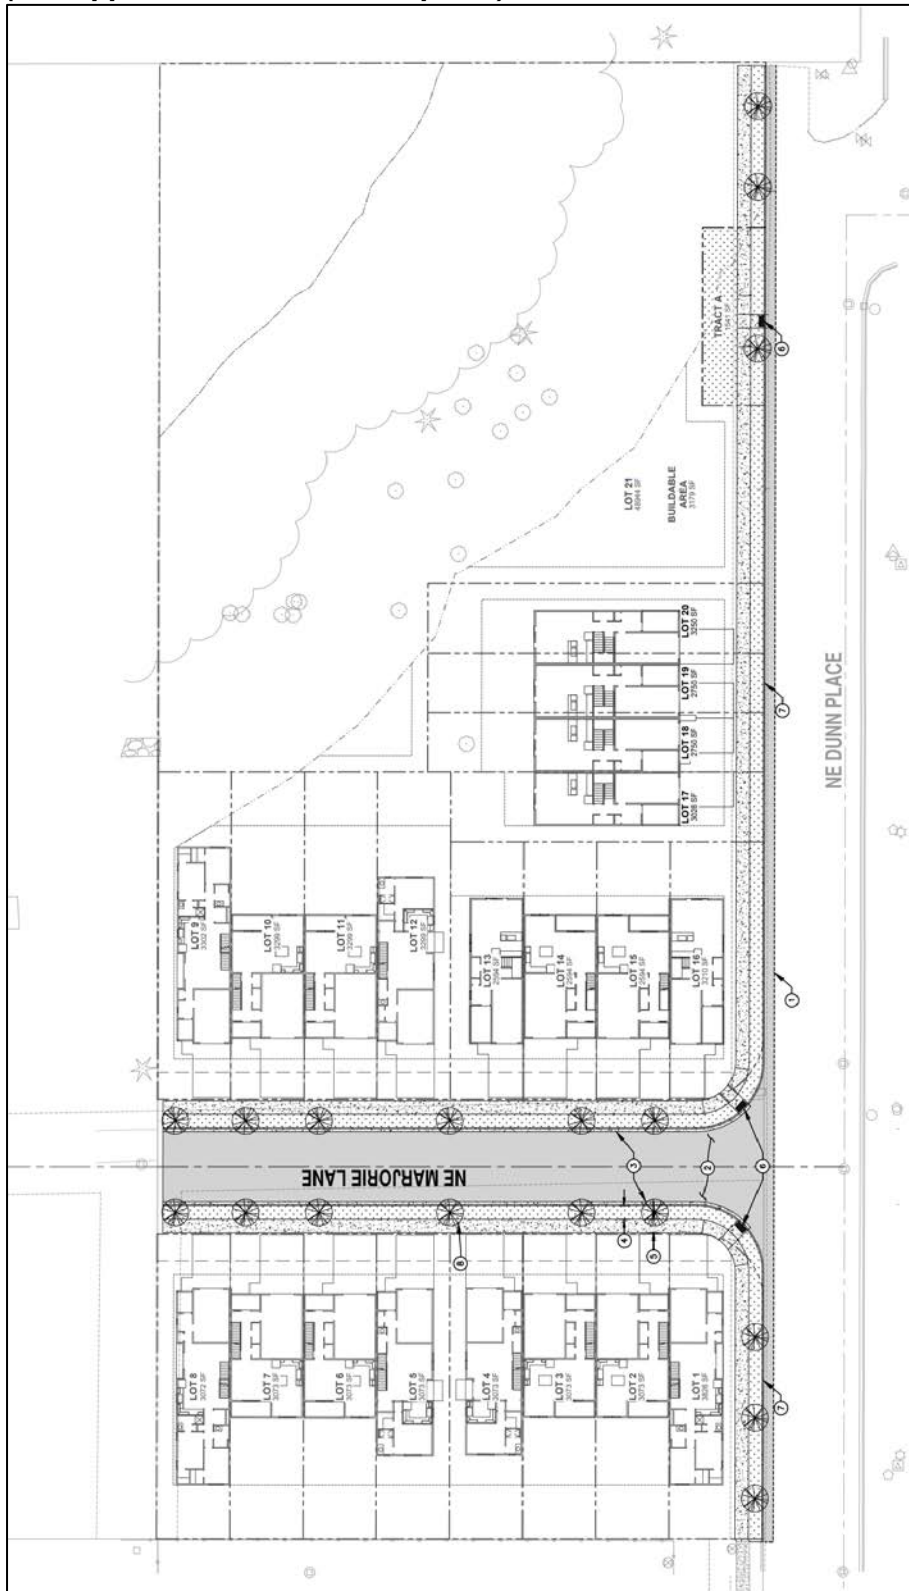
Proposed Plan – Floorplans and Elevations, 1-12
